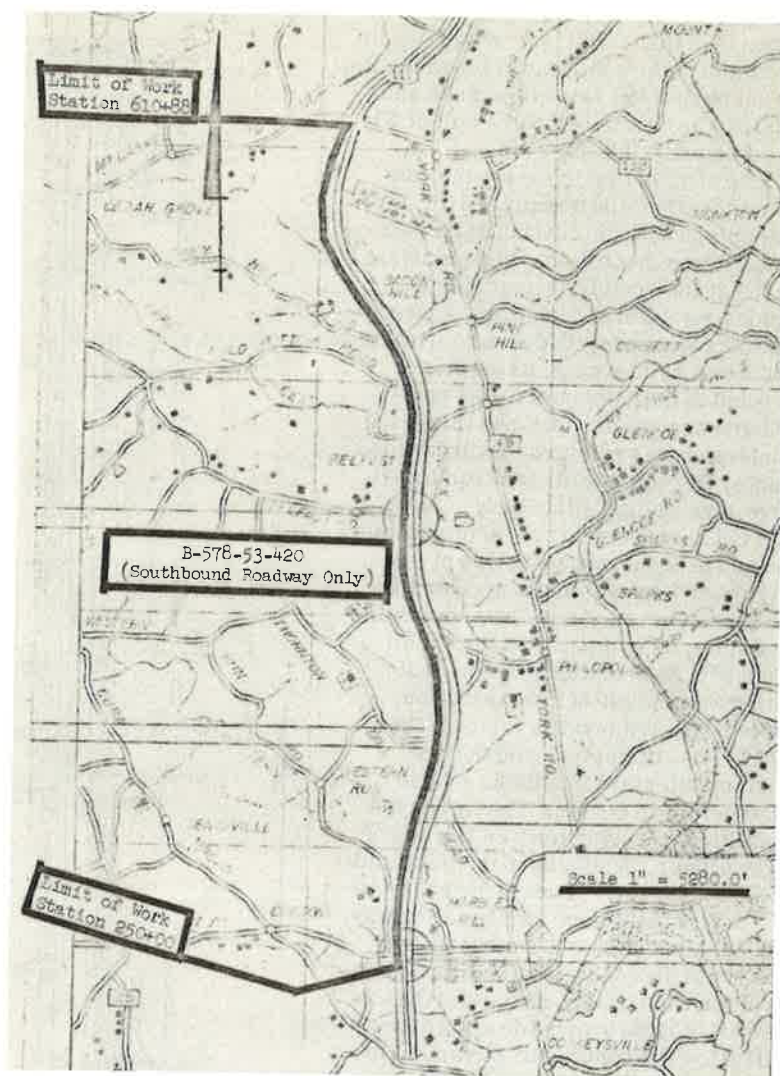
General location of experimental continuously-reinforced concrete pavement, Project 53.
